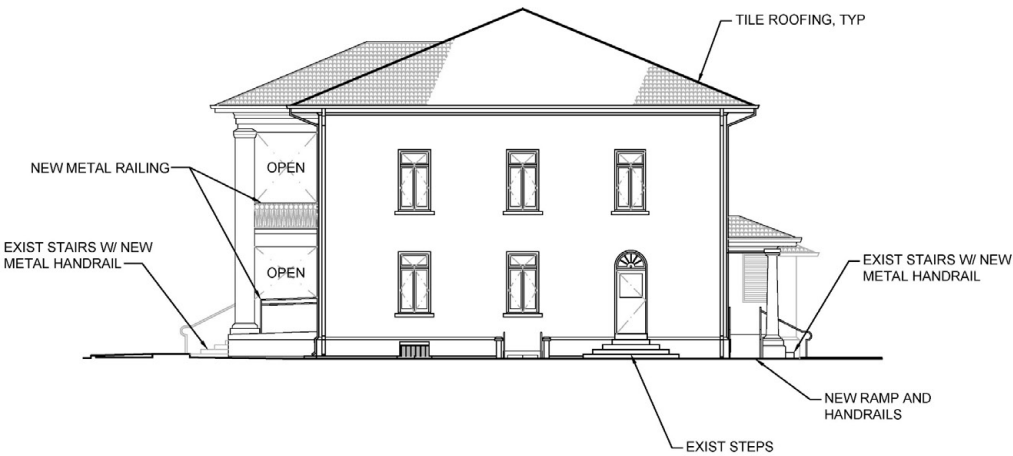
Old Lahaina Courthouse Mauka Elevation.
